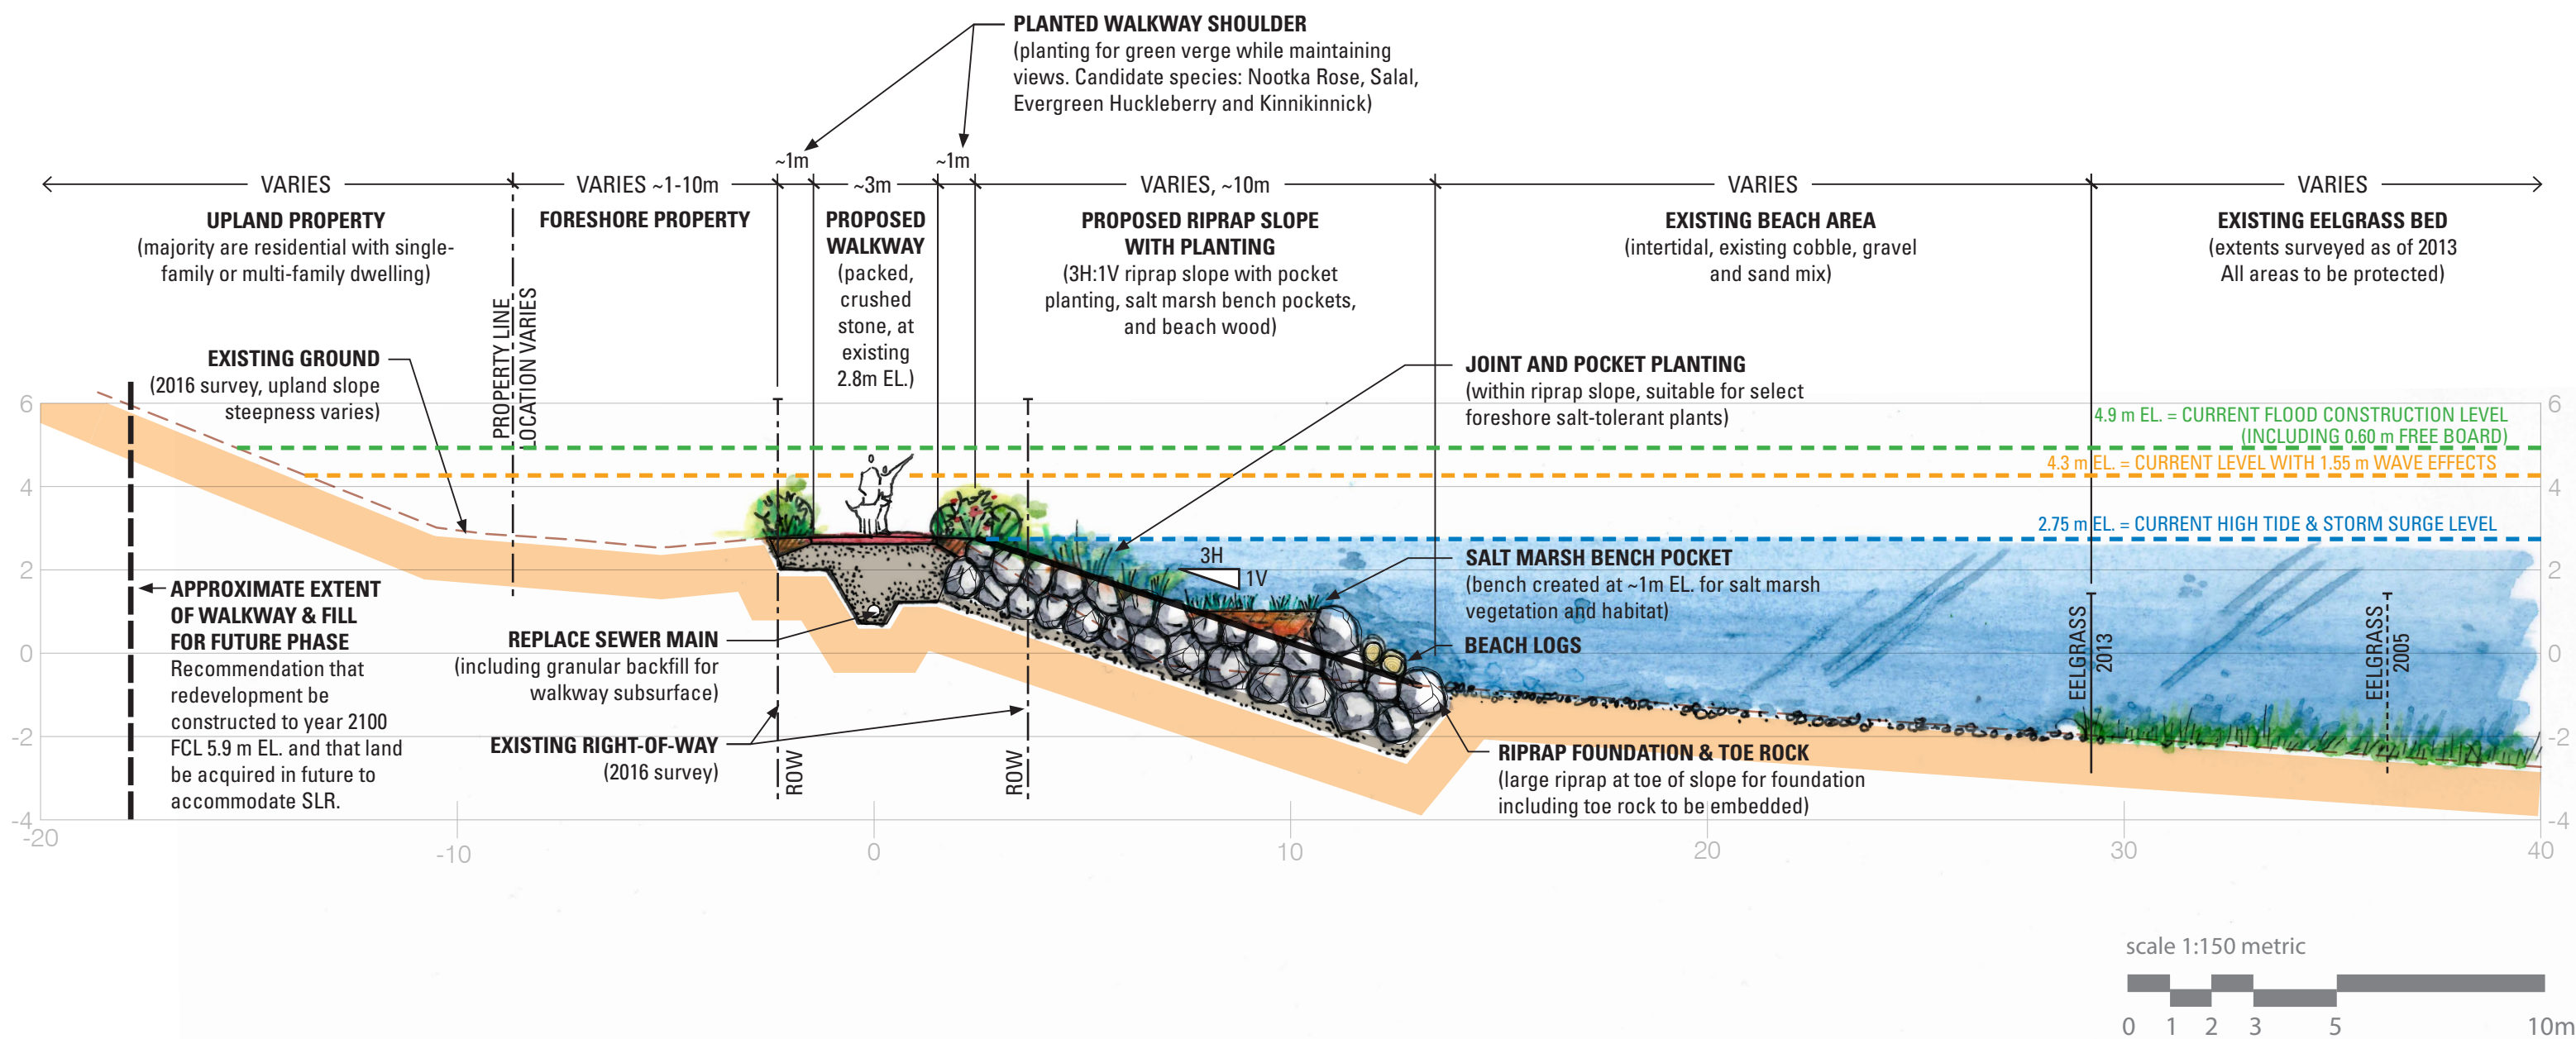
| TYPICAL SECTION - LONG-TERM
